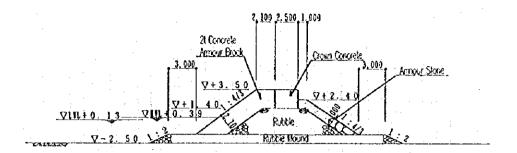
4- 20 Standard Cross Section of Breakwater Trunk
